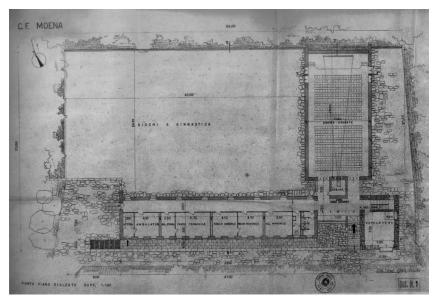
Mezzina, plan, Casa del Fascio, Moena (Trento), 1942. Archivio Centrale dello Stato, Partito Nazionale Fascista, Servizi Varie, Serie II, b. 1607.
